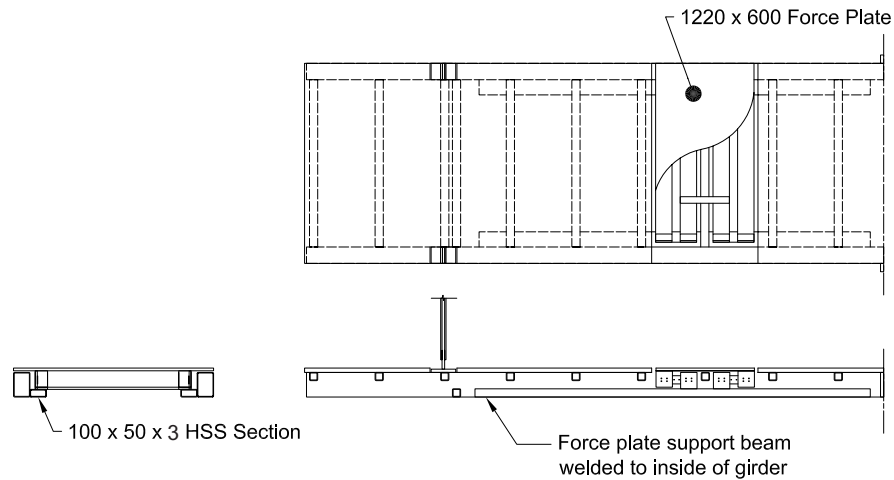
Modified bridge (compare with Figure 2.7) with one force plate and the force plate support beam installed.
